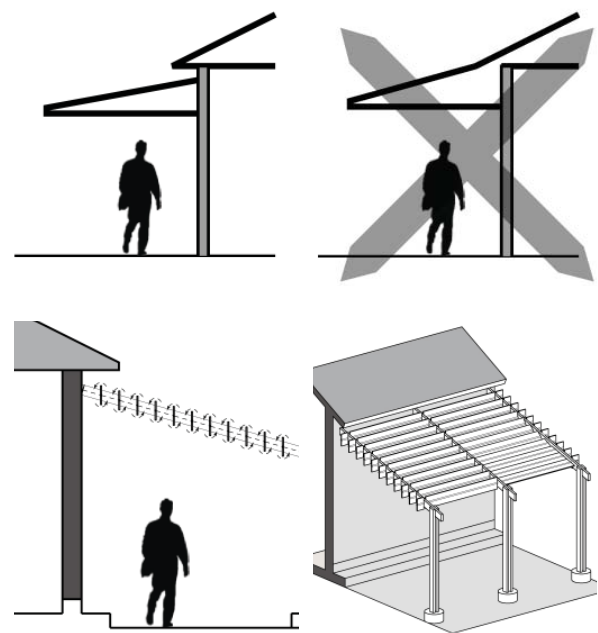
Guiding principles for the design of a roofs and eaves subjected to a tropical storm.
